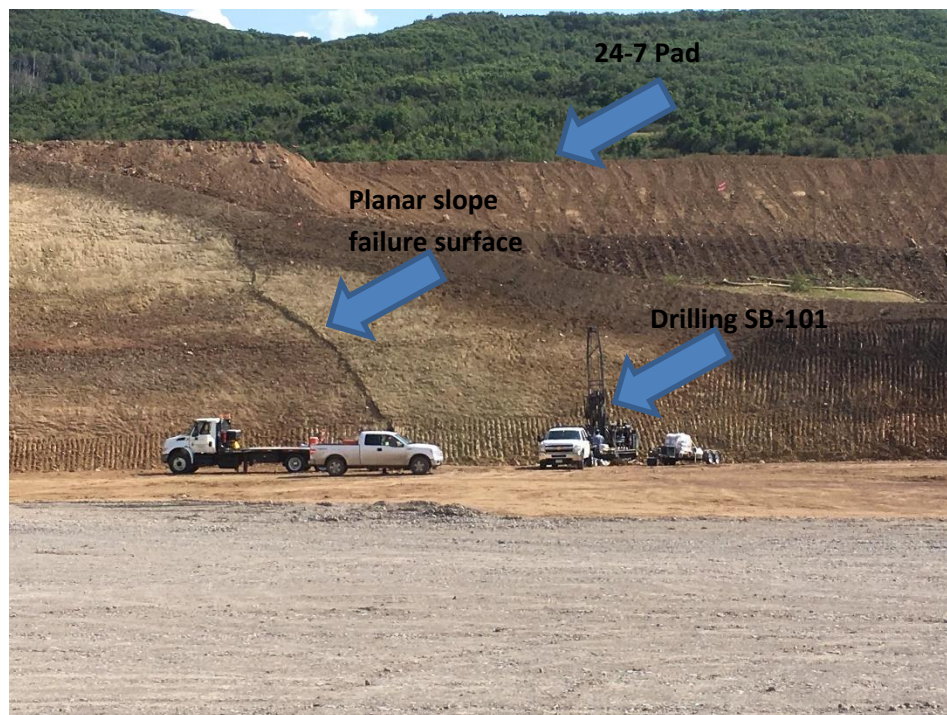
Looking S toward 6A pad cut slope and 7 pad (above).
